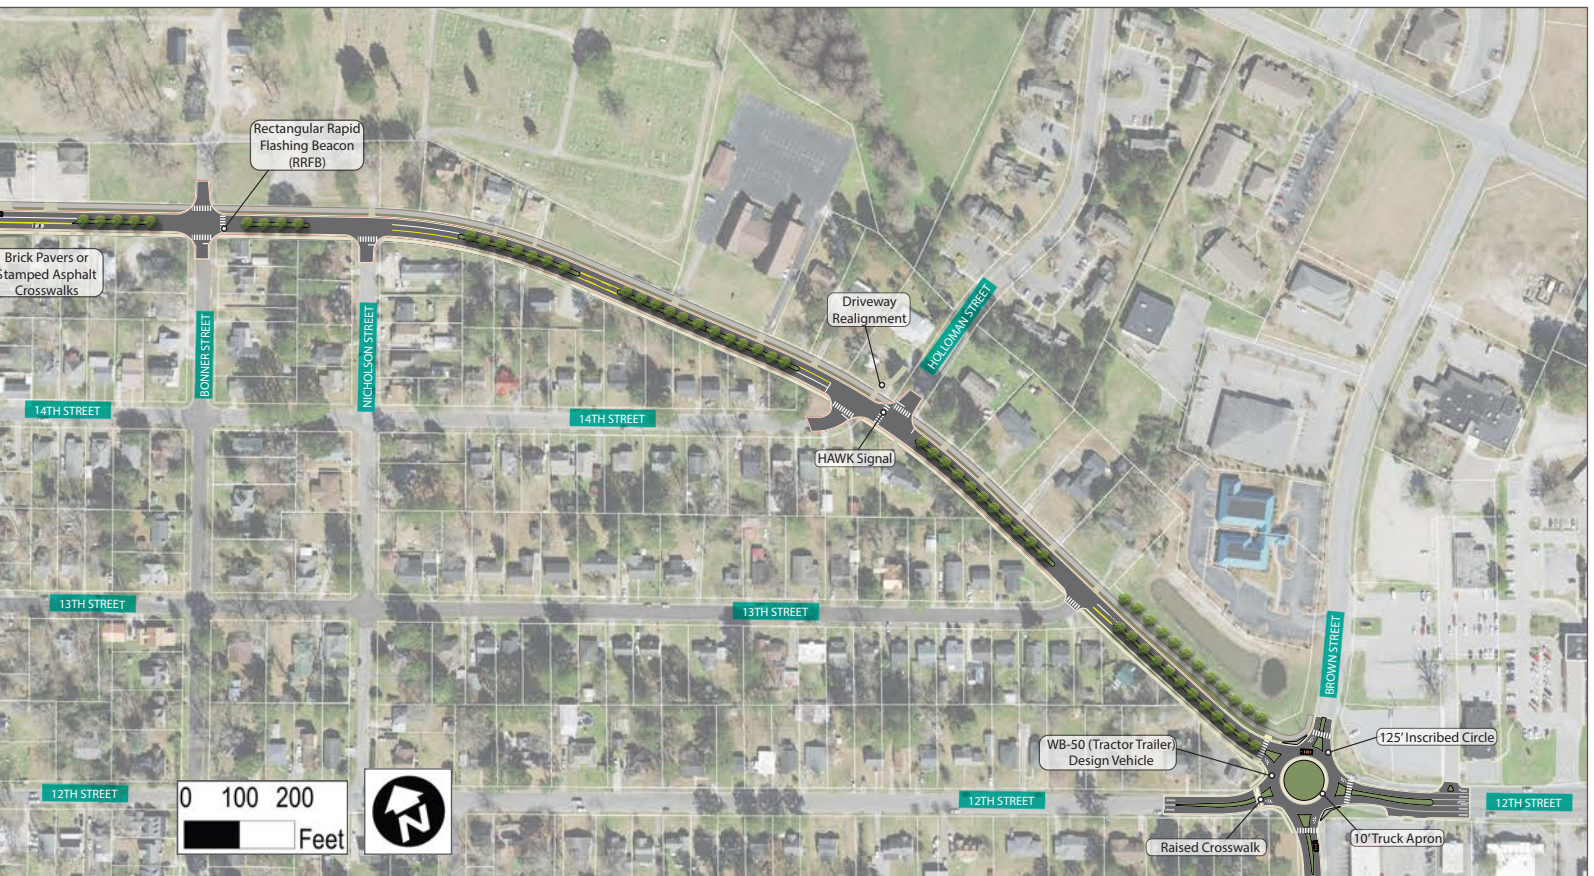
Proposed concept designs for Van Norden Street to Brown Street.
